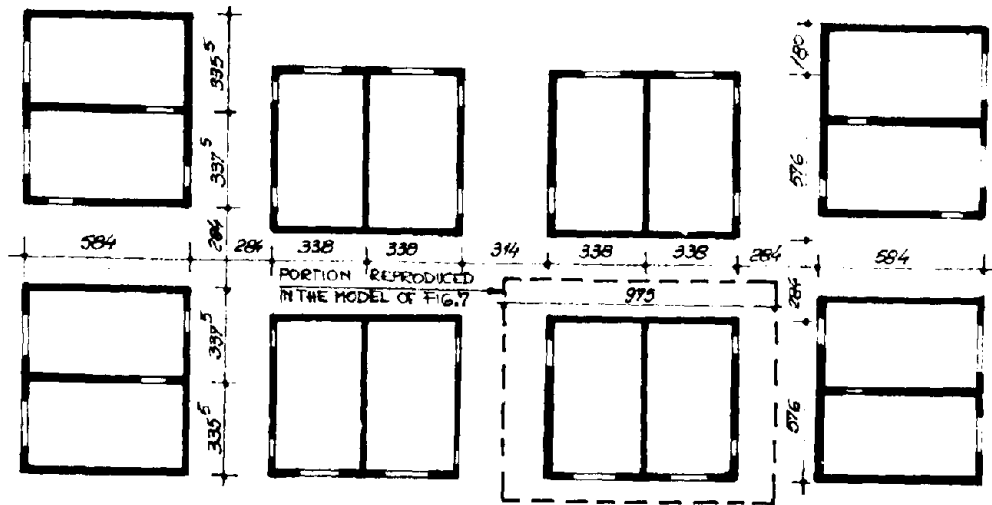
ARRANGEMENT OF CORES WITHIN THE PLAN OF A NINE STORY STRUCTURE.
